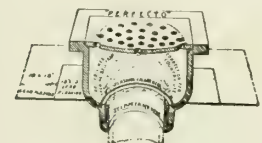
FIG. N. COW BARN OR STABLE FLOOR DRAIN PERFORATED OR BARRED, SHOWING INSTALLATION OF BELL TRAP
